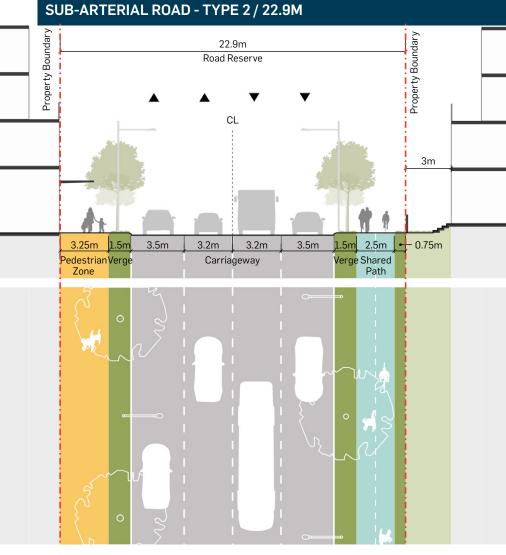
Indicative Street Section A-A' - Sub-Arterial Road - Type 2
